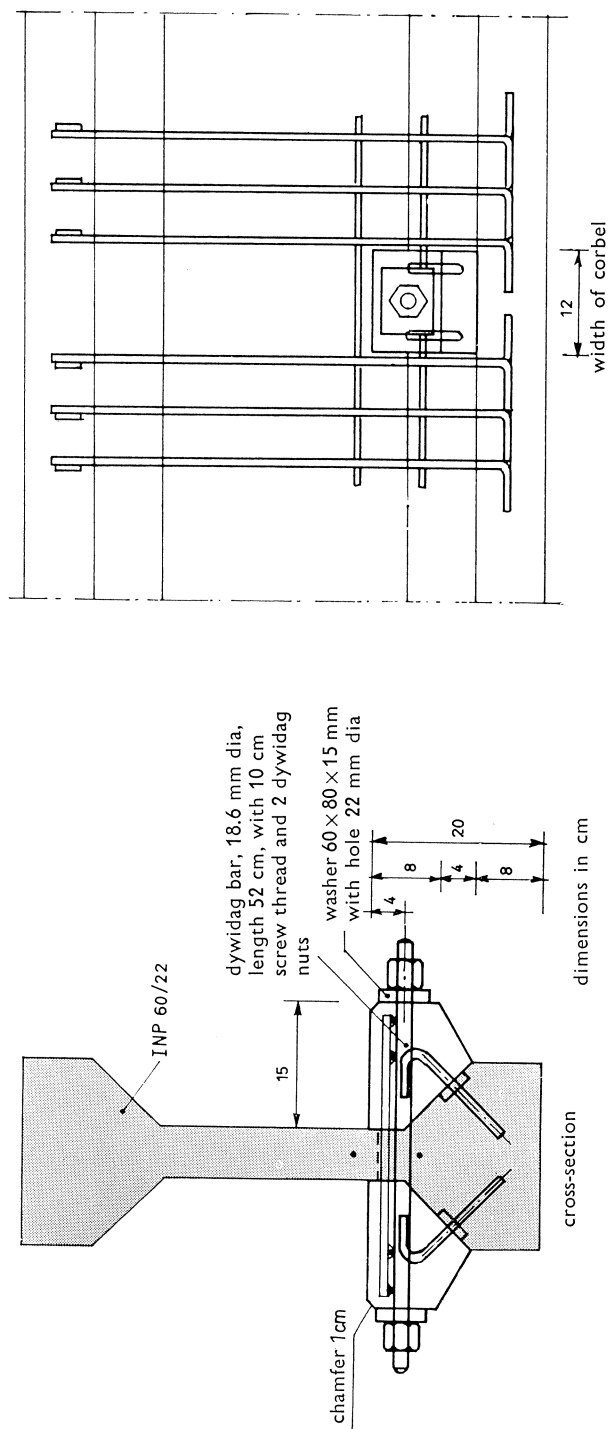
Corbel subsequently cast on to the beam and provided with a Dywidag prestressing bar.
